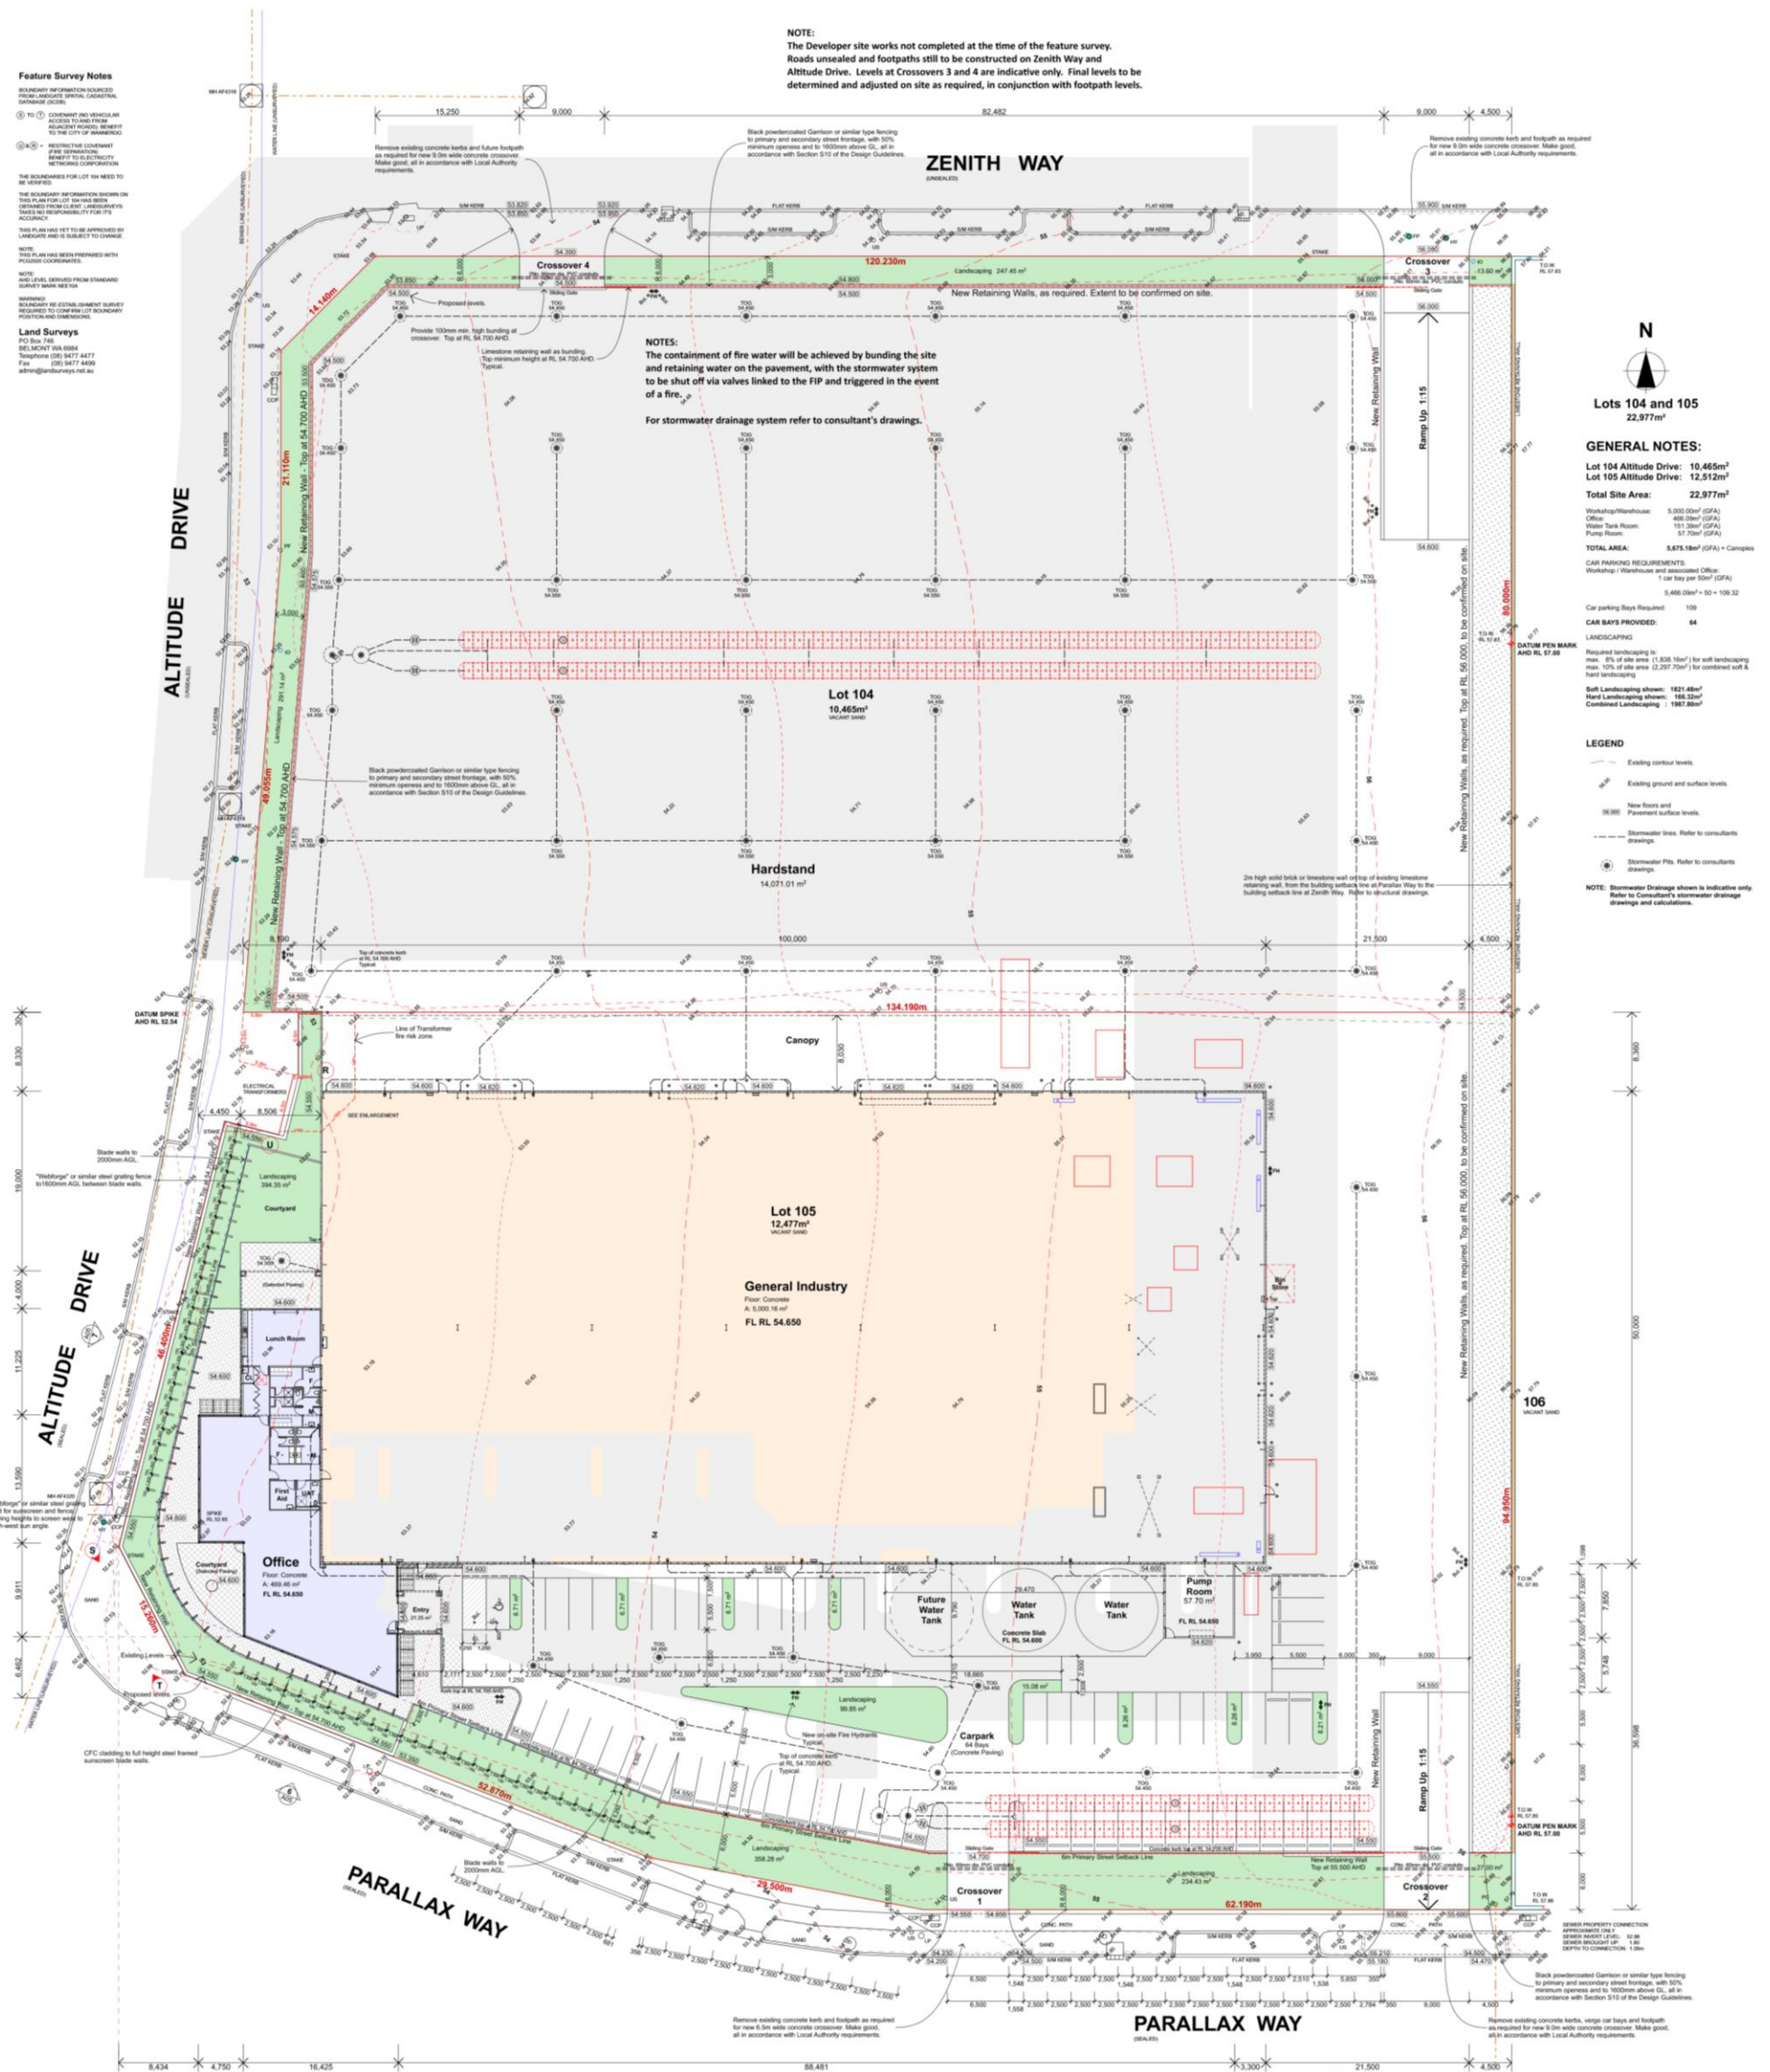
Site plan showing the proposed premises stormwater drainage infrastructure
